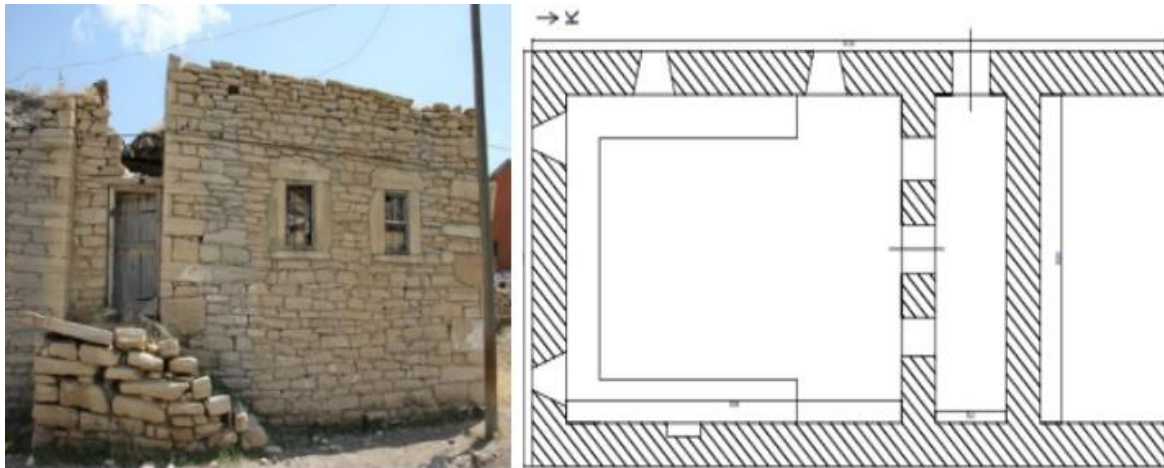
Erzincan-Çayırılı-Başköy Kaya Koçgil's Village Room, Left: General View of the Room, Right: Plan of the Room (Naldan, 2020).
